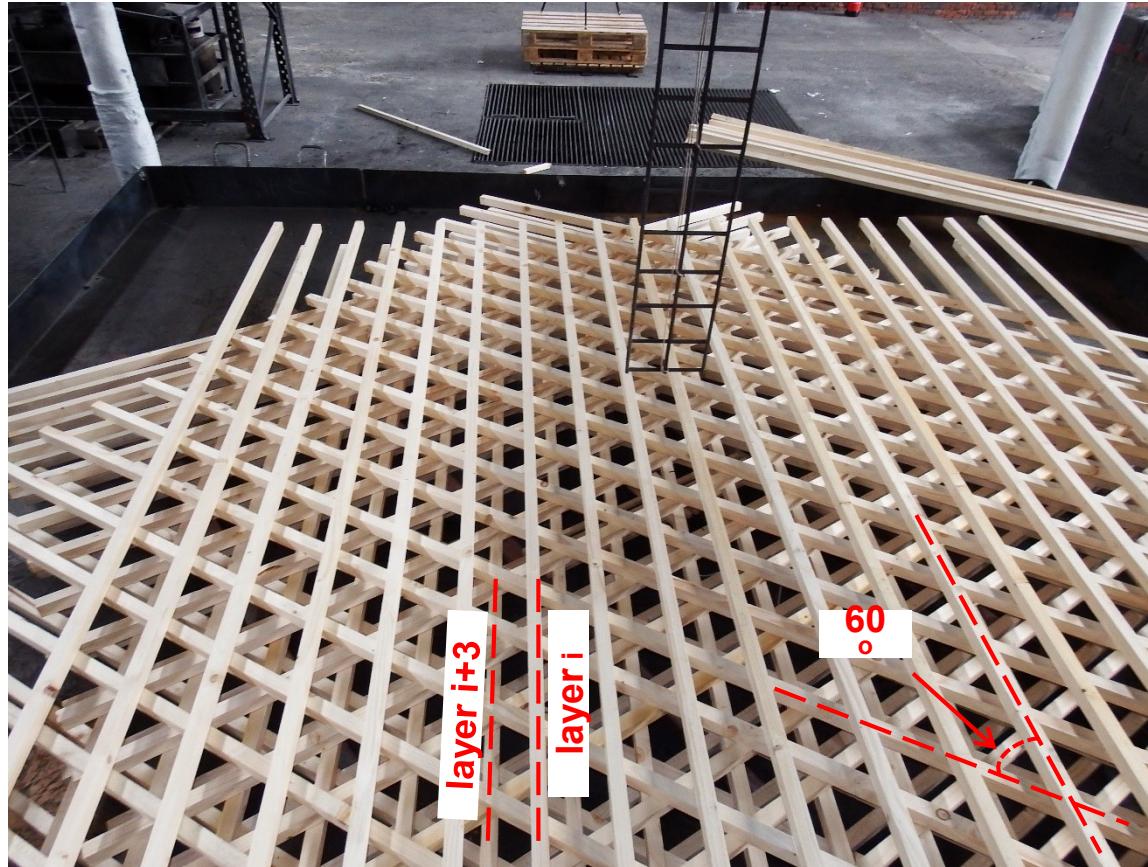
Wood stick arrangement in plan view: wood sticks orientation shifted 60° every layer, and every three layers wood sticks shifted horizontally for half of wood stick pitch.
